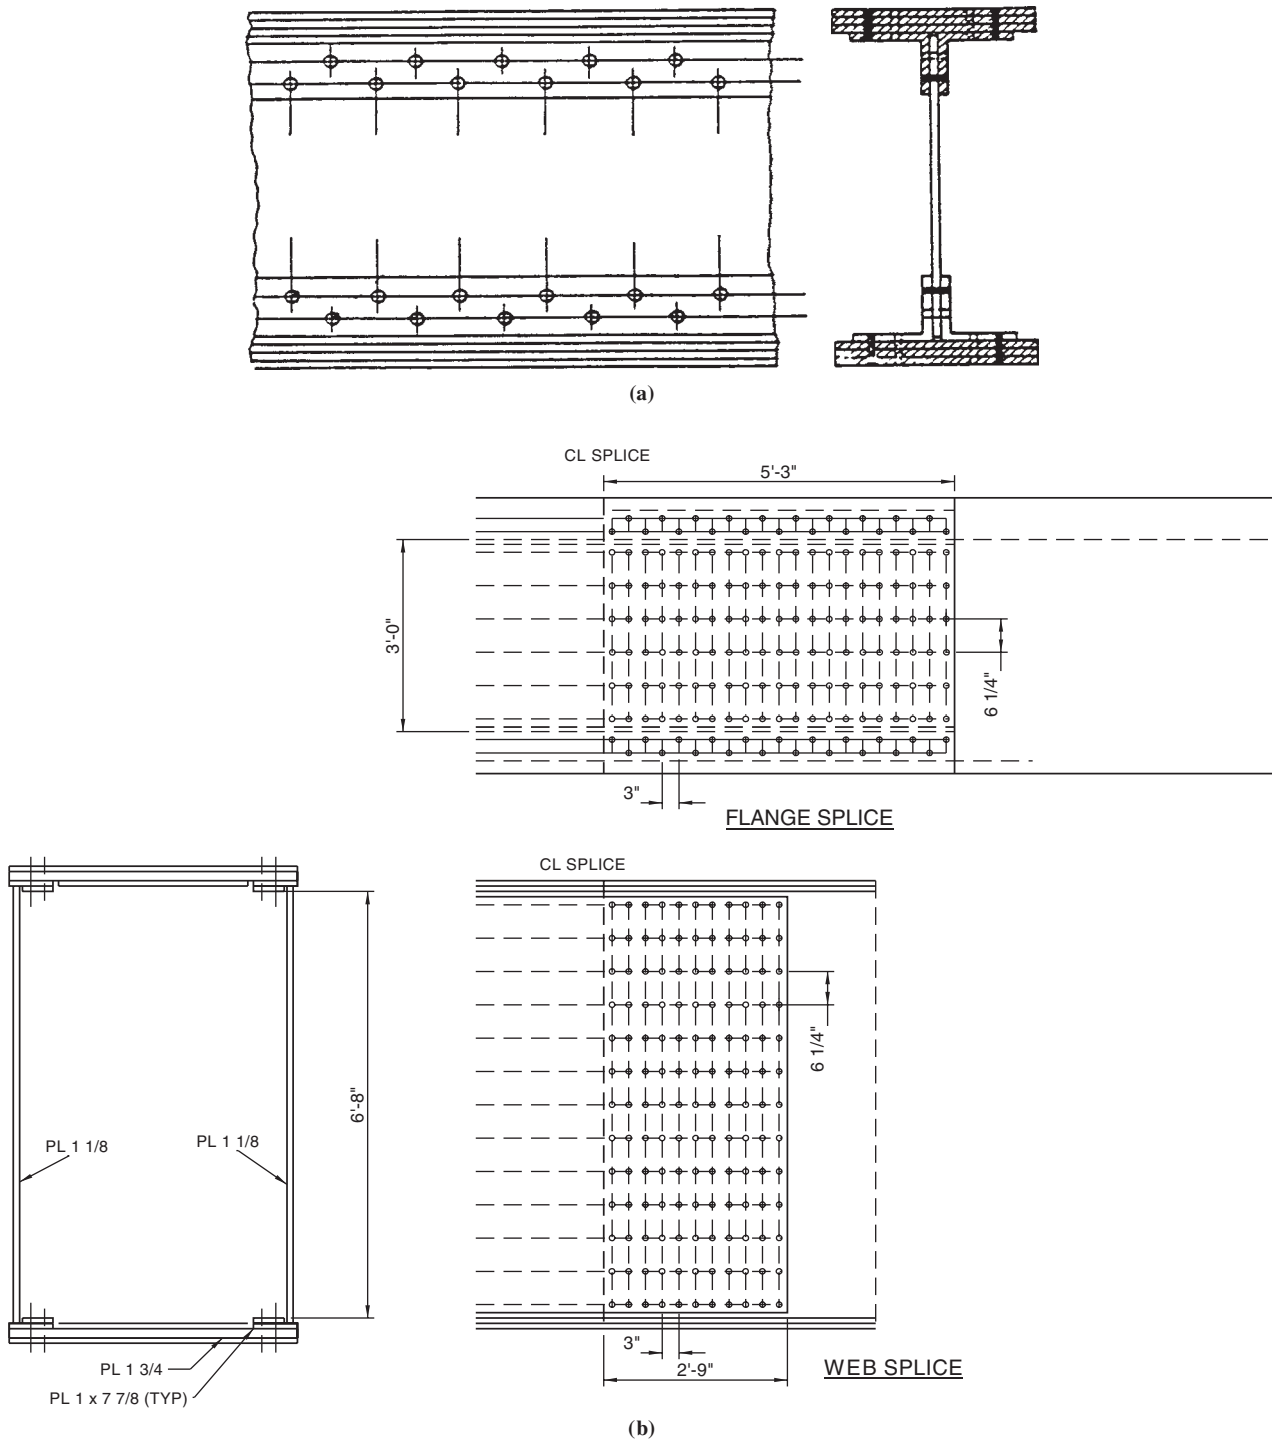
Examples of internally redundant members: (a) riveted built-up girder and (b) bolted built-up tie girder proposed for Blennerhassett Arch Bridge. (Courtesy: Michael Baker Jr., Inc.)
